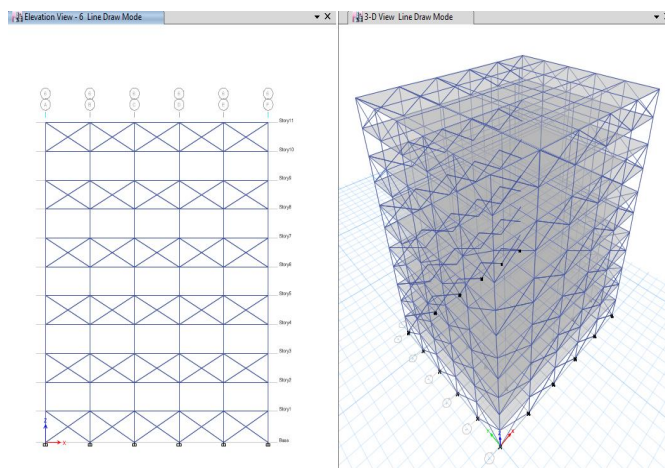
Elevation and 3D View of braced Building Model at 0 degree angle of slopin
